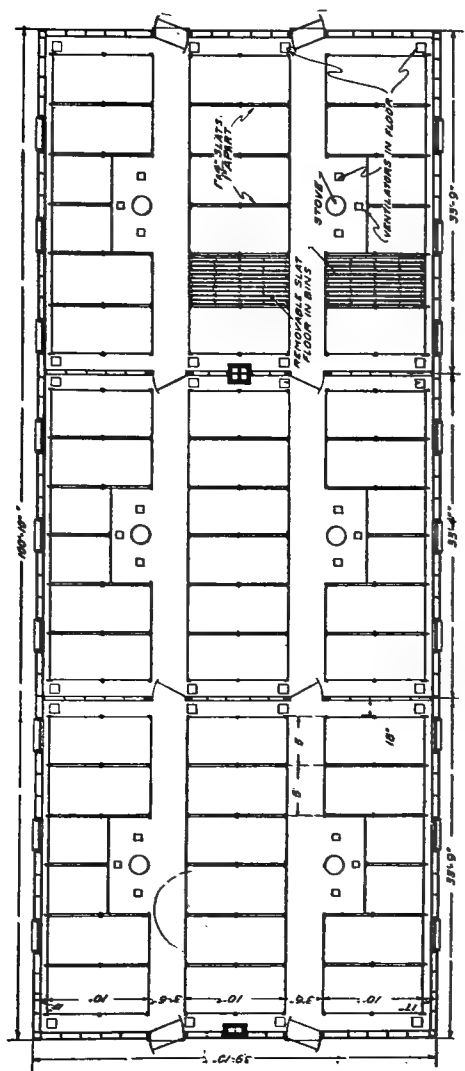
Floor plan of a 40 by 100 foot sweet potato storage-house having a capacity of 15,500 bushels.
